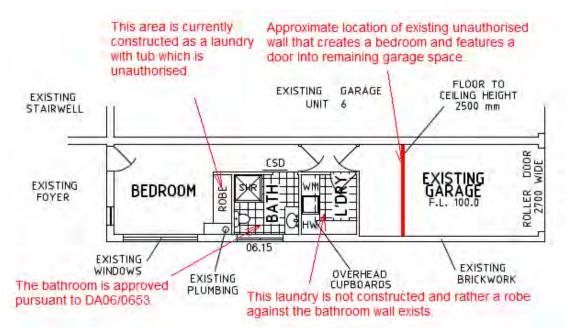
Unit 5 Garage Level floor plan proposed. Red annotation outlines existing unauthorised works.
